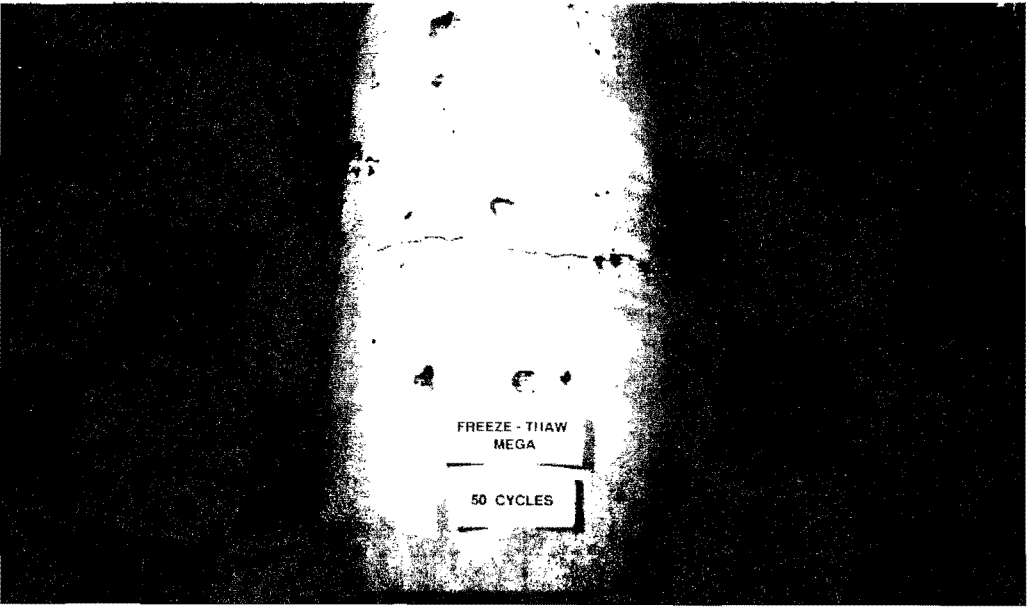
ECT H specimen exhibiting cracks after 50 cycles of freezing and thawing exposure.
